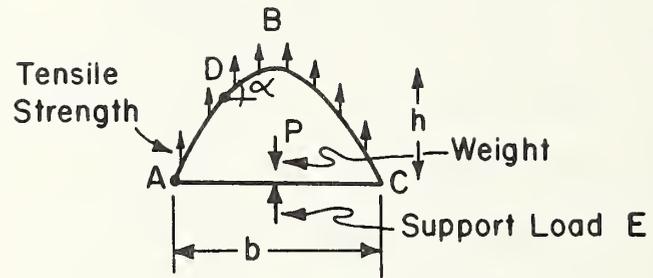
RITTER'S (1879) METHOD : FLAT ROOF
